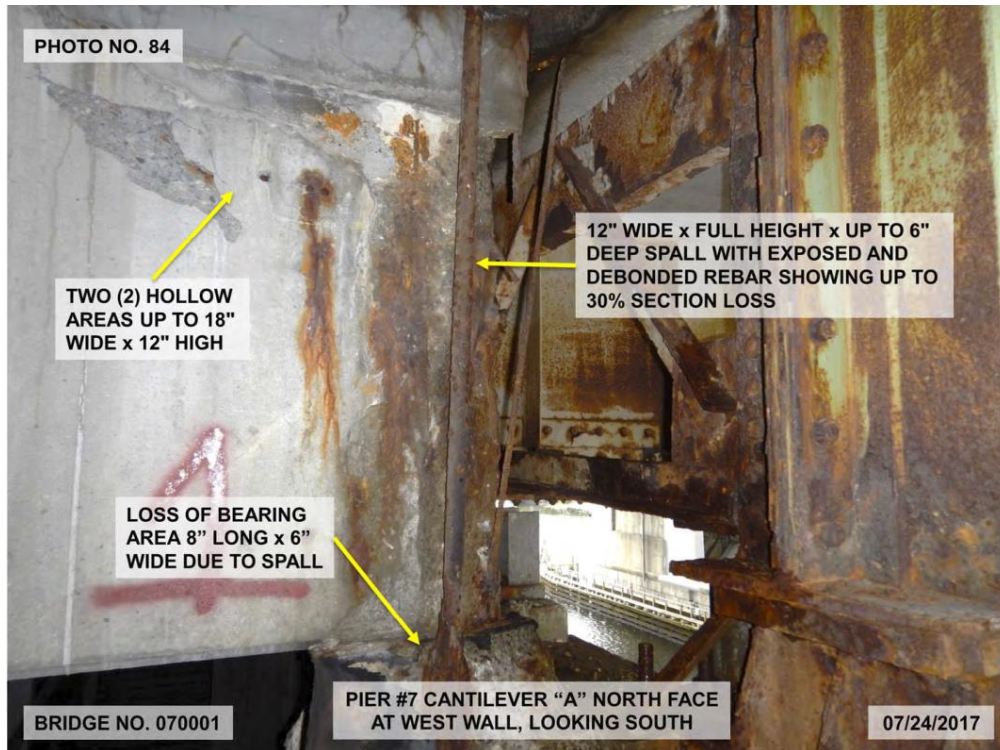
Inspection photo of exterior tie-down rod for cantilever beam A at Pier 7 taken July 2017 (Collins).
